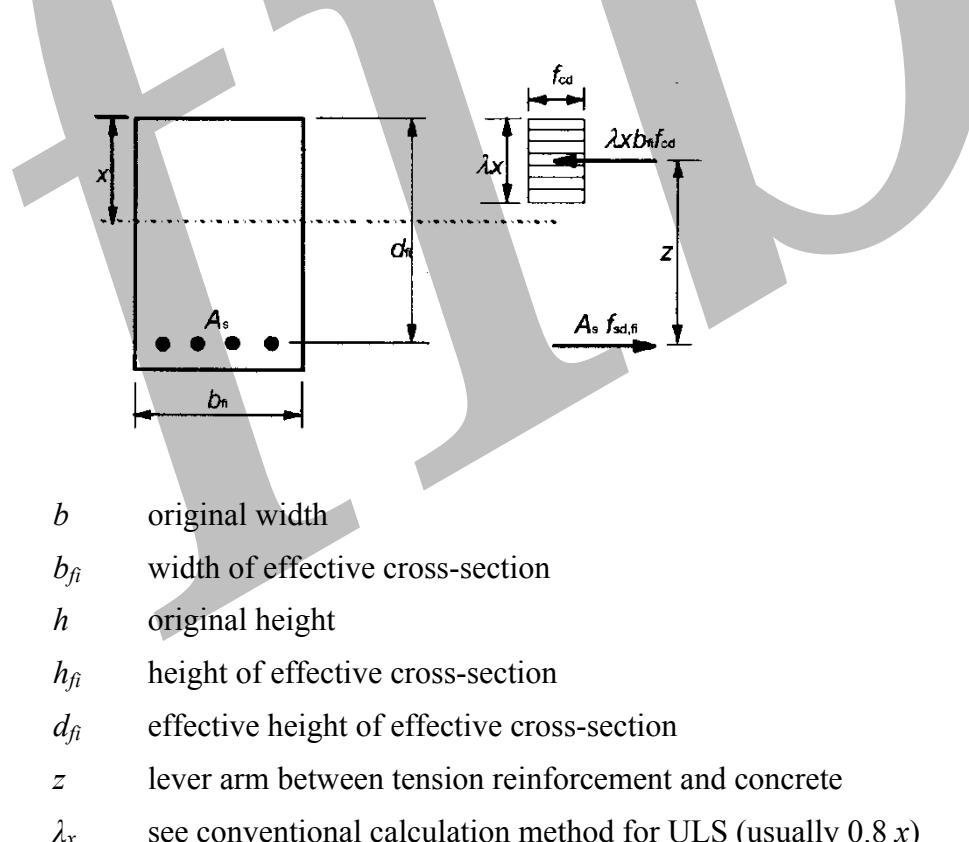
Stress distribution at ULS for a rectangular concrete cross-section
